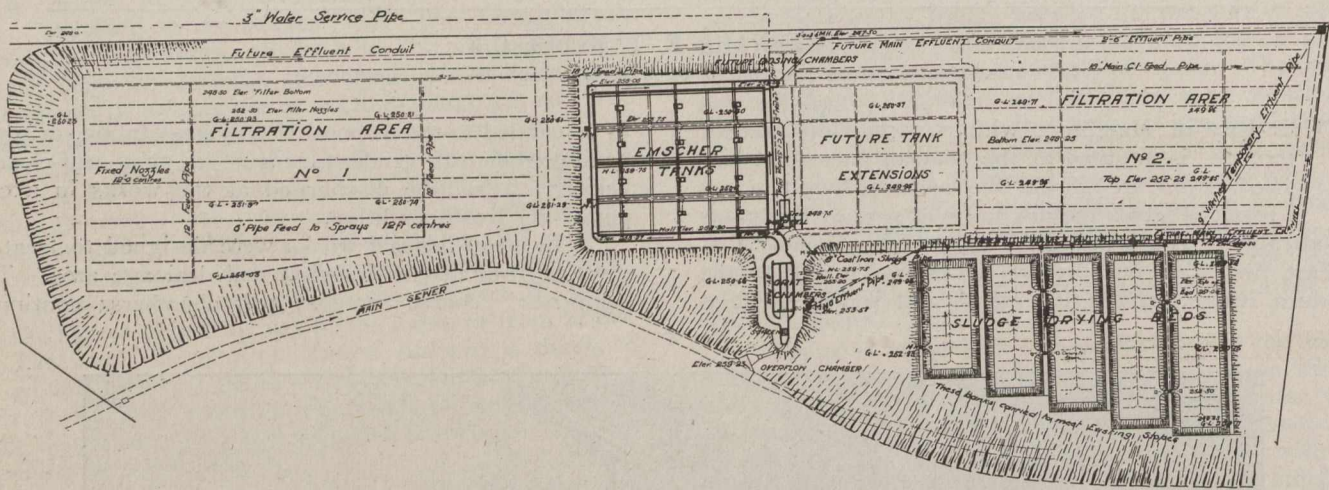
General Layout of West End Disposal Works, Hamilton.
